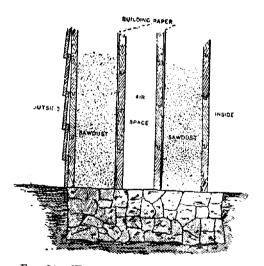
WALL OF FRUIT-STORAGE CELLAR.
